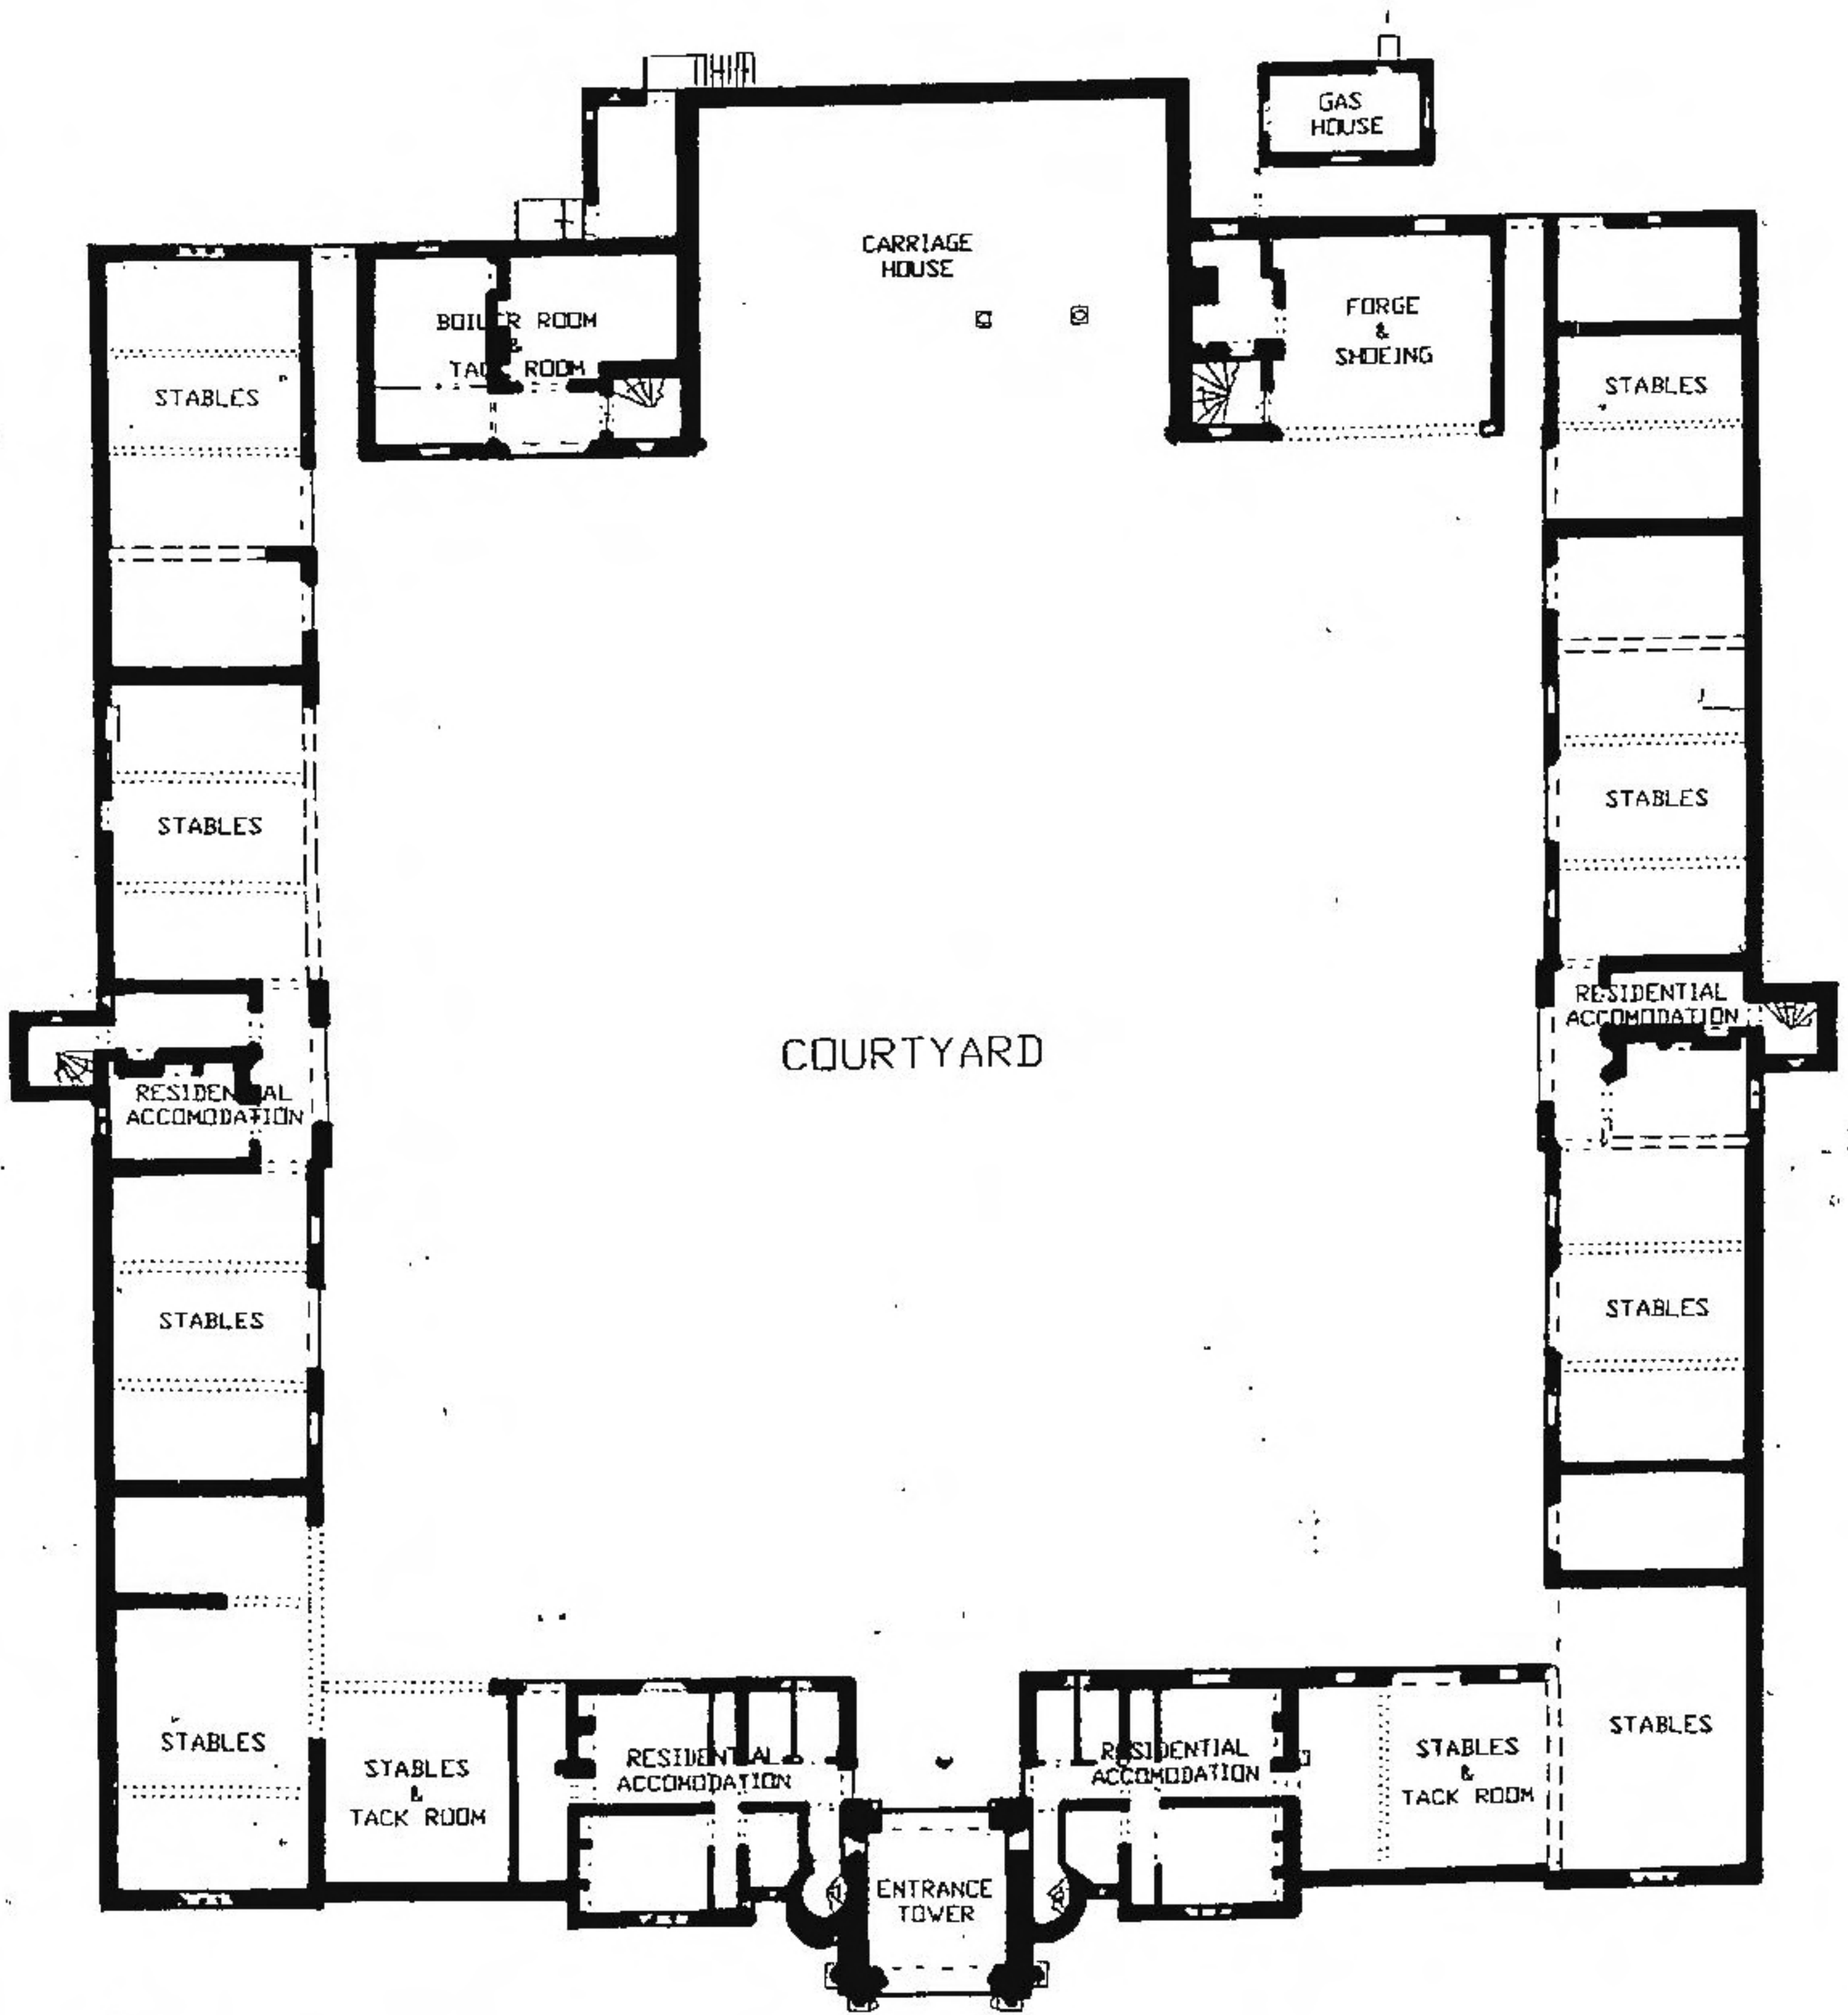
Layout - Bradgate Stables Enlarged detail based on First Edition, Ordnance Survey, 1:2500 map, 1883, Sheet XXIV.4
